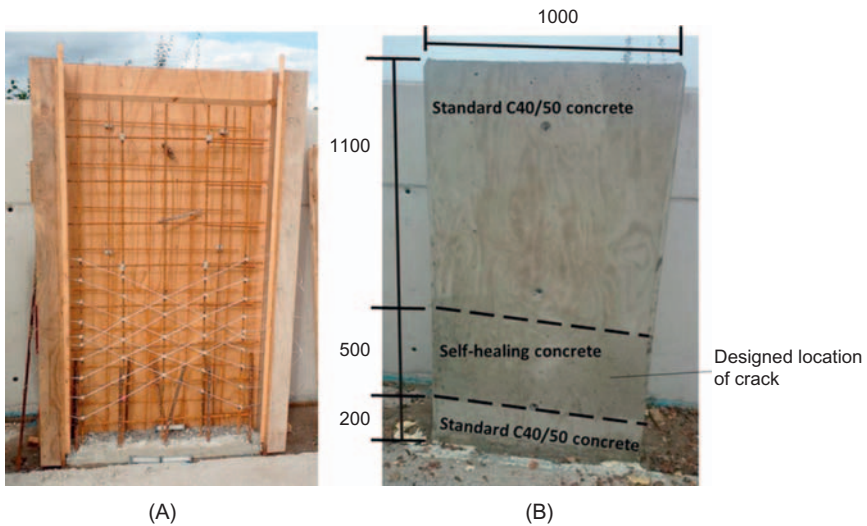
M4L wall panels: (A) Embedded capillary network installed prior to casting of the concrete, (B) completed panel containing bacteria-based self-healing concrete (dimensions in mm).
